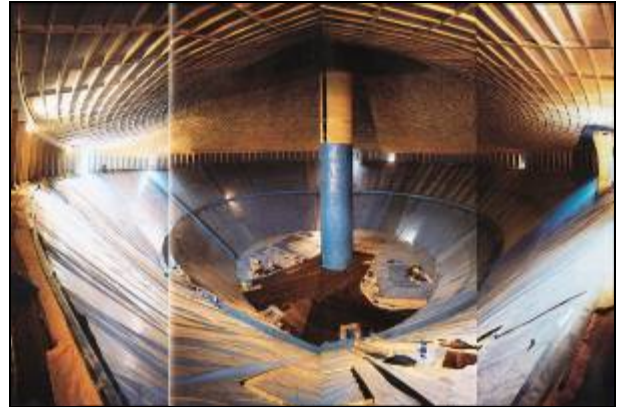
Reservoir Hills concrete potable water reservoir refurbished with a lining of EVA over a protective geotextile and drainage net
